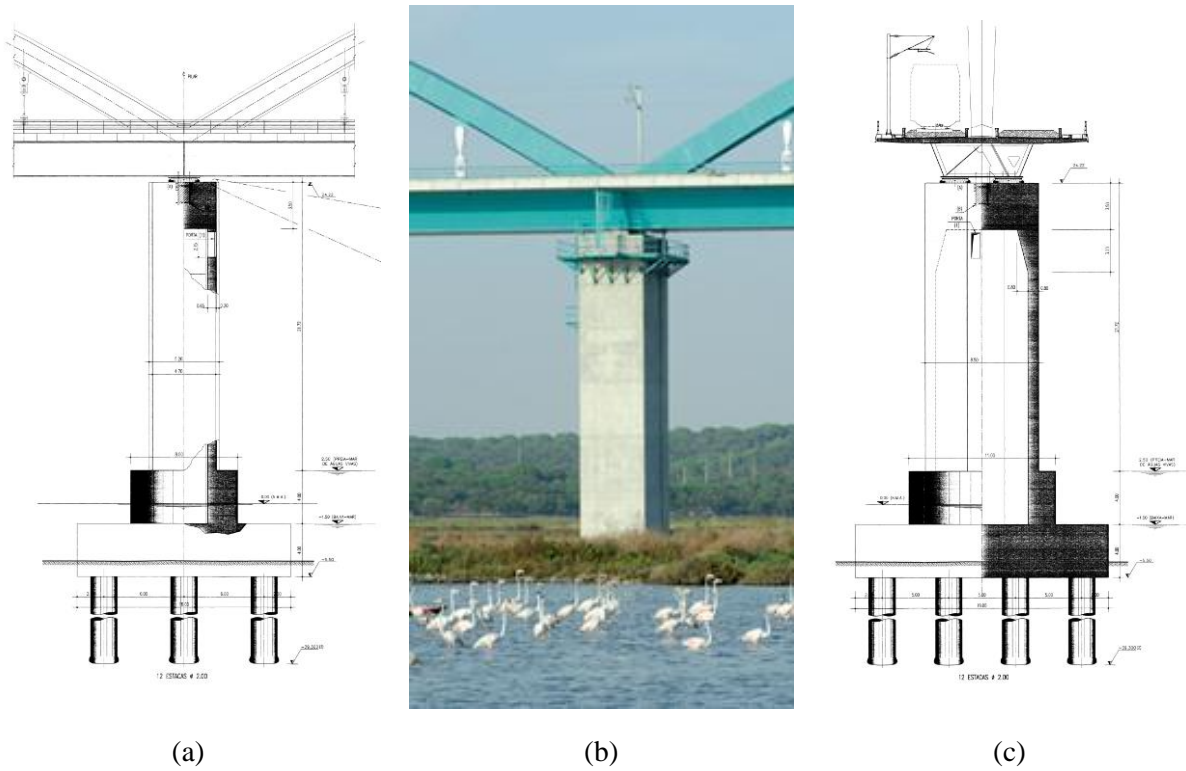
Pier P2: (a) side elevation (GRID et al., 2006), (b) actual photograph (REFER, 2010) and (c) front elevation (GRID et al., 2006).
